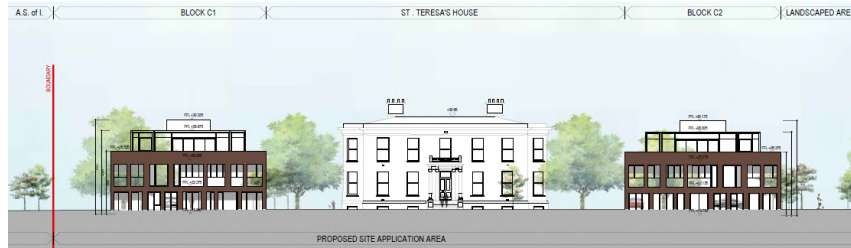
The permitted Block C1 and C2 either side of St Teresa’s House (ABP-303804-19)
